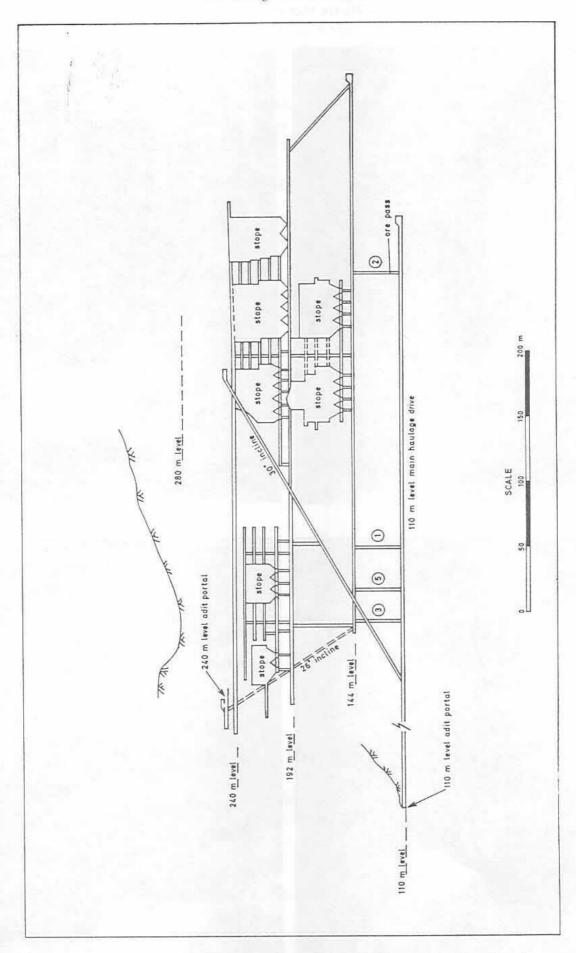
Schematic cross-section of Ma On Shan mine showing the layout of the workings
